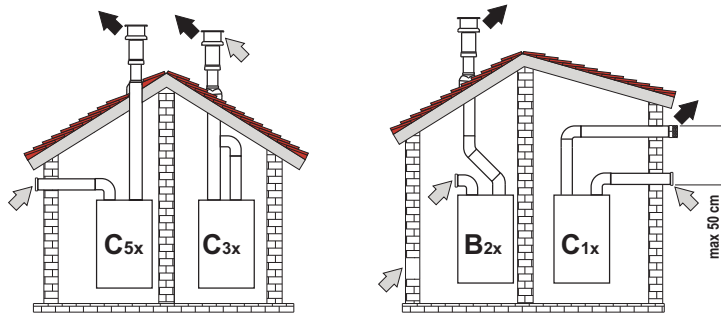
Examples of connection with separate pipes (⇨ = Air / ⇨ = Fumes)
